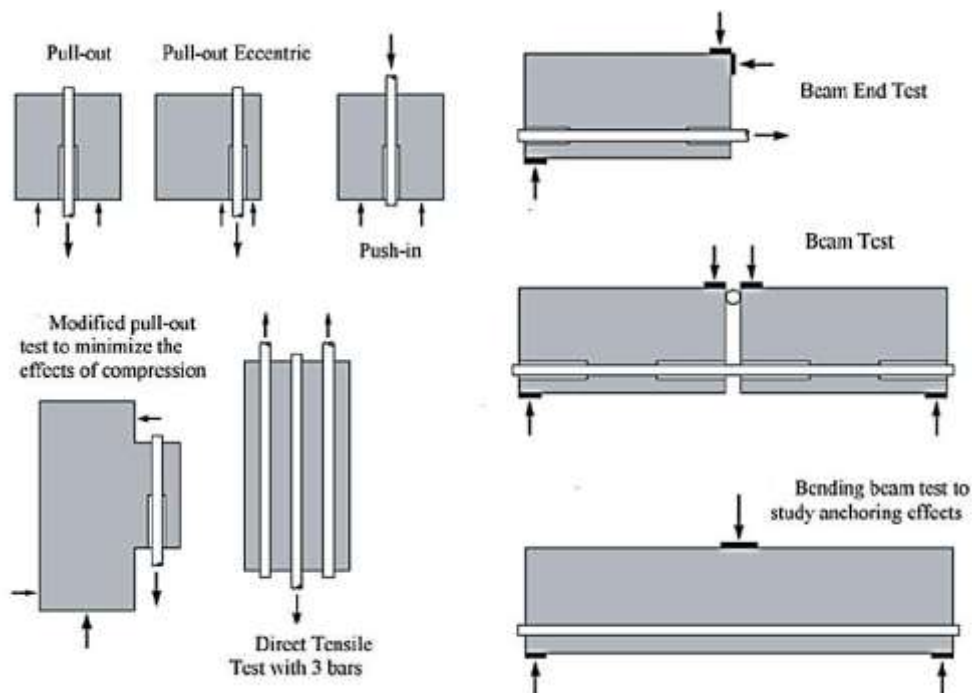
Different test setups used for the study of bond between rebar and concrete (modified from [183])
